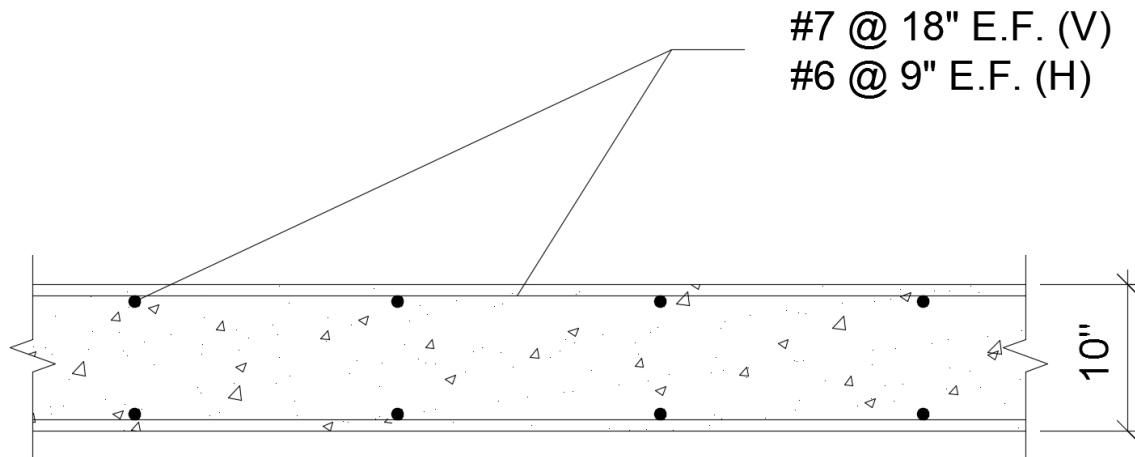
Segment of exterior wall cross-section at the 2nd floor level based on SDC D design.
